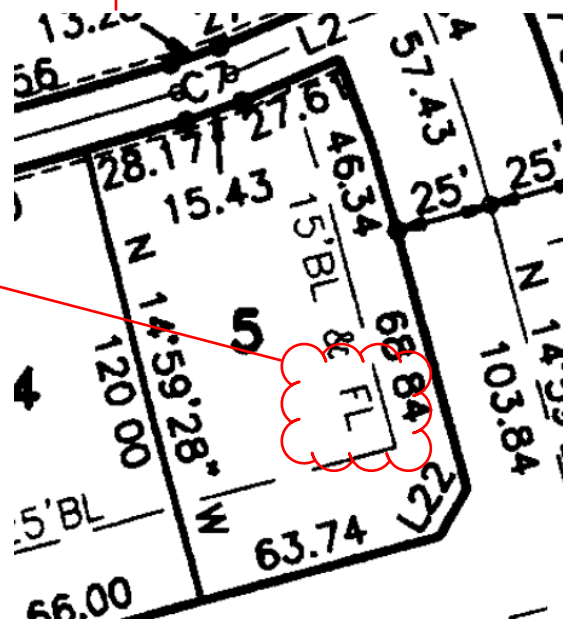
EXHIBIT B: SUBDIVISION PLAT & DETAIL
